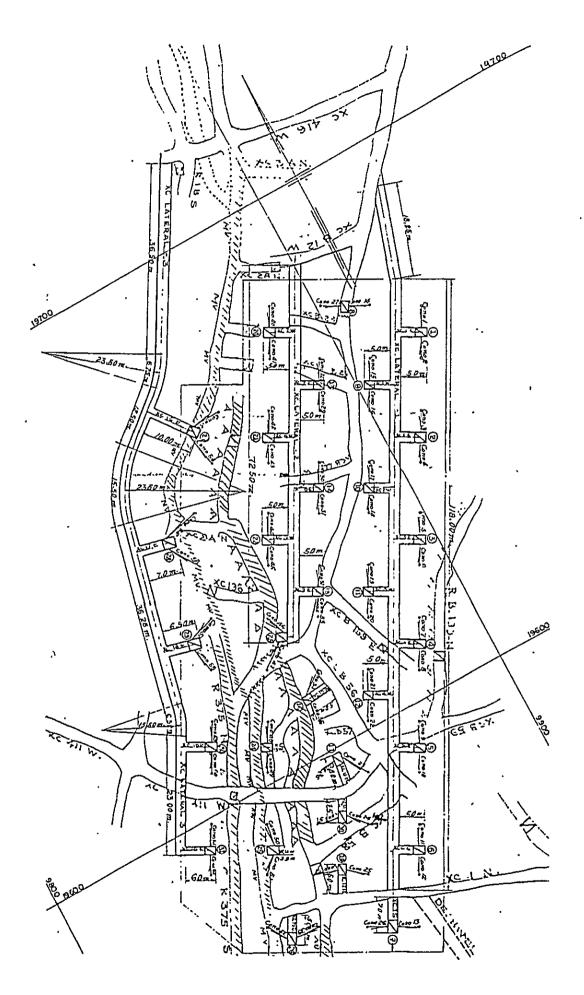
Layout of Drift at Grizzly Level, Block 5-D
